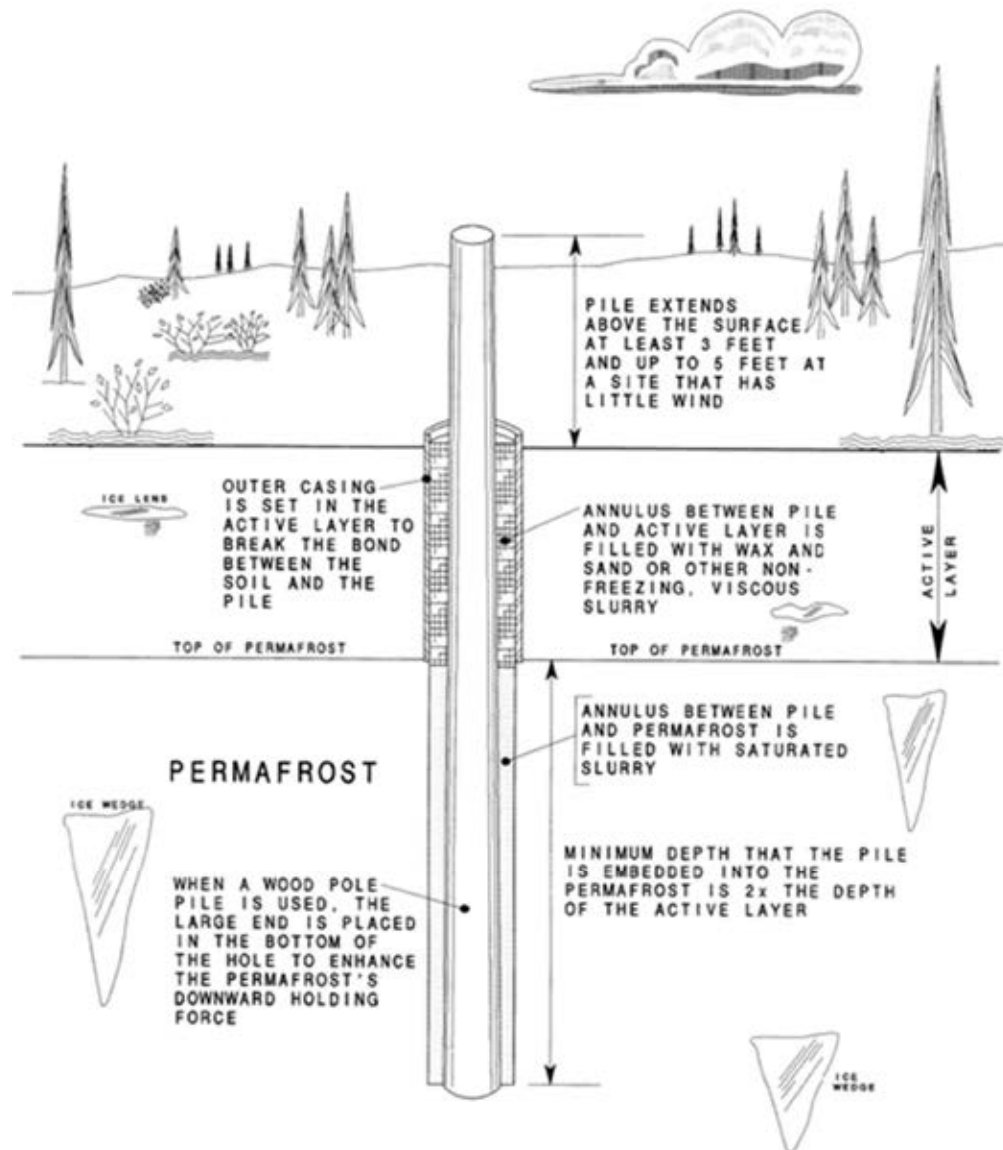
Typical slurried pile installation in permafrost (McFadden 2000)
